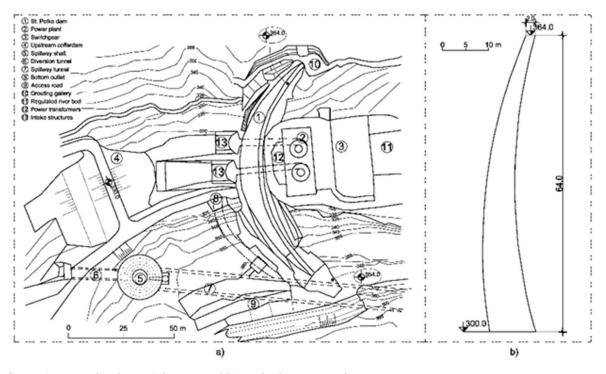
St. Petka dam. a) layout and b) typical cross-section.
